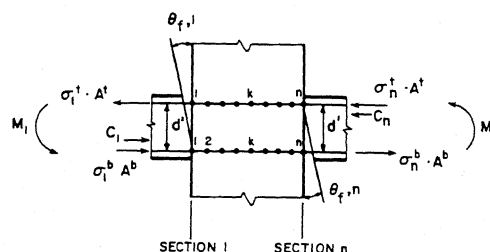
ANALYTICAL MODEL FOR INTERIOR BEAM-COLUMN JOINT
